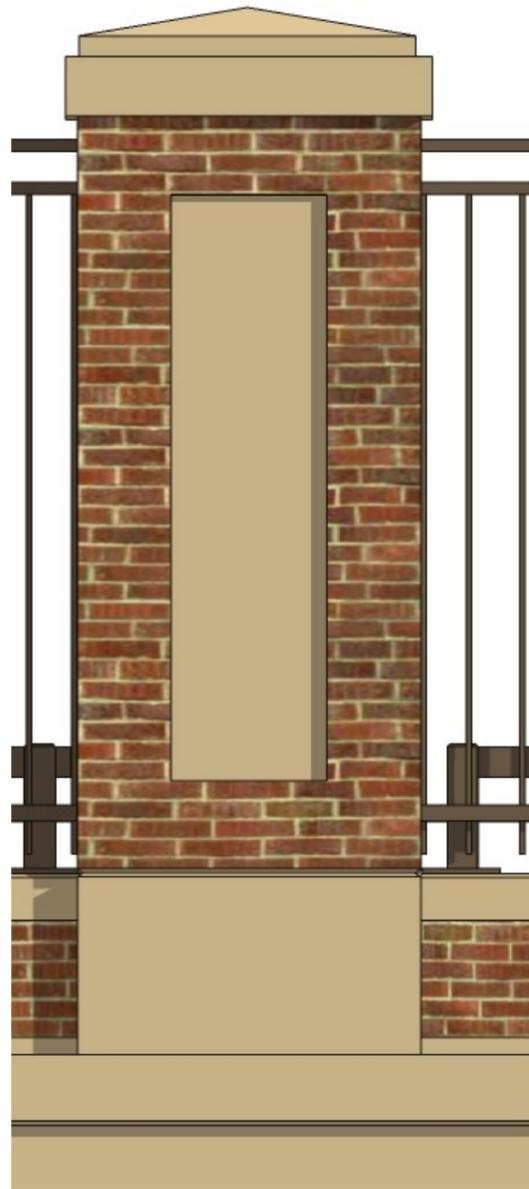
Exterior View of Bridge Railing, Pilasters and Fence
